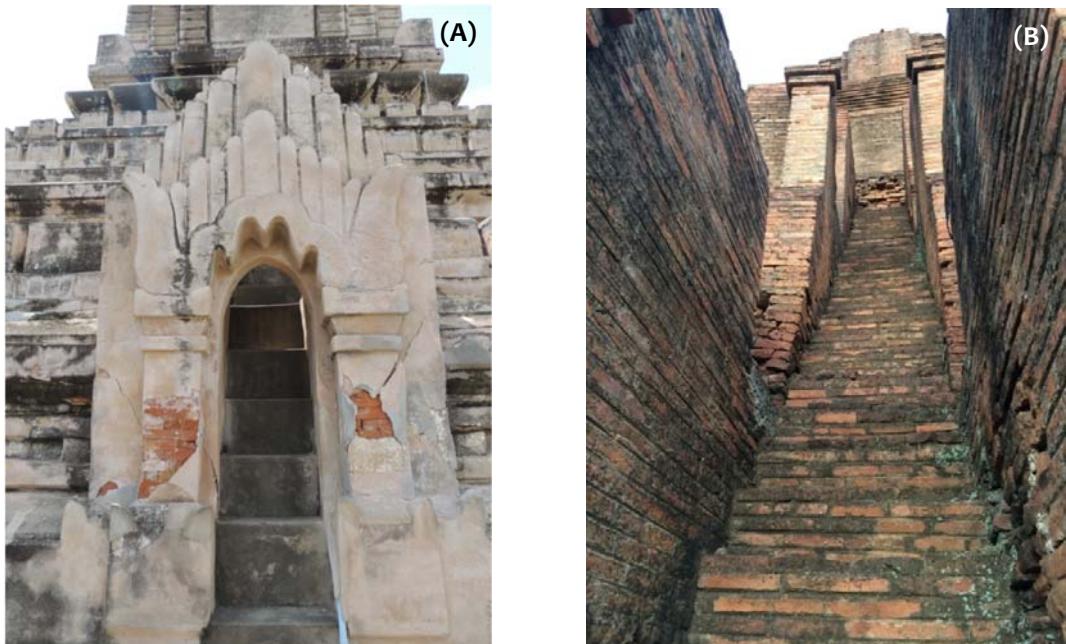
(A) Shear cracking at the supports of the entrance structure to the stairway; (B) Overturning of parapet walls along the stairway
